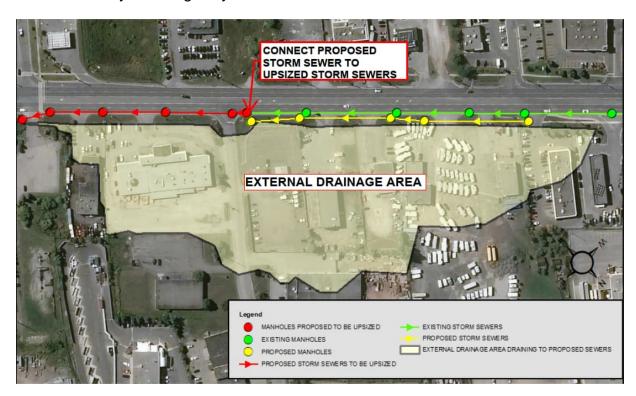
External Drainage Area & Proposed Storm Sewer System (North of - Highway 50 & George Bolton intersection)
